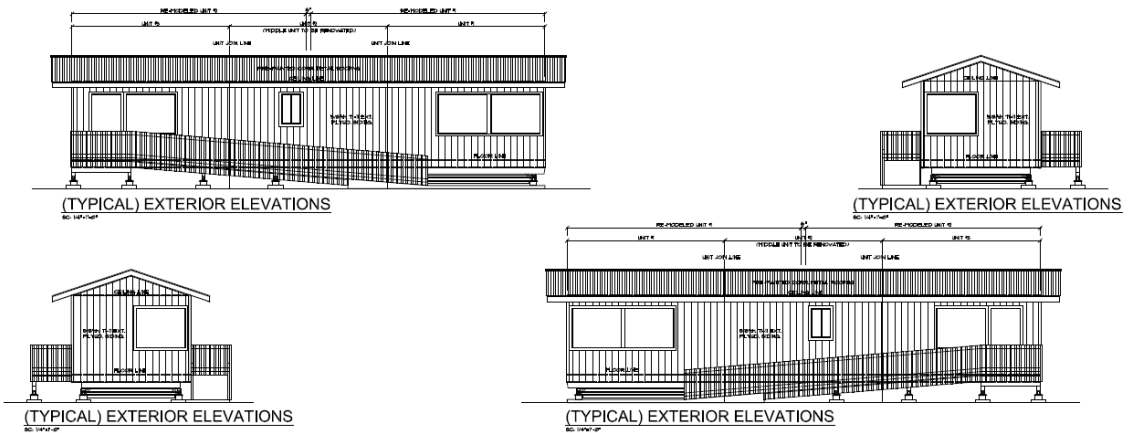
Typical Double Unit Exterior Elevations²¹¹
